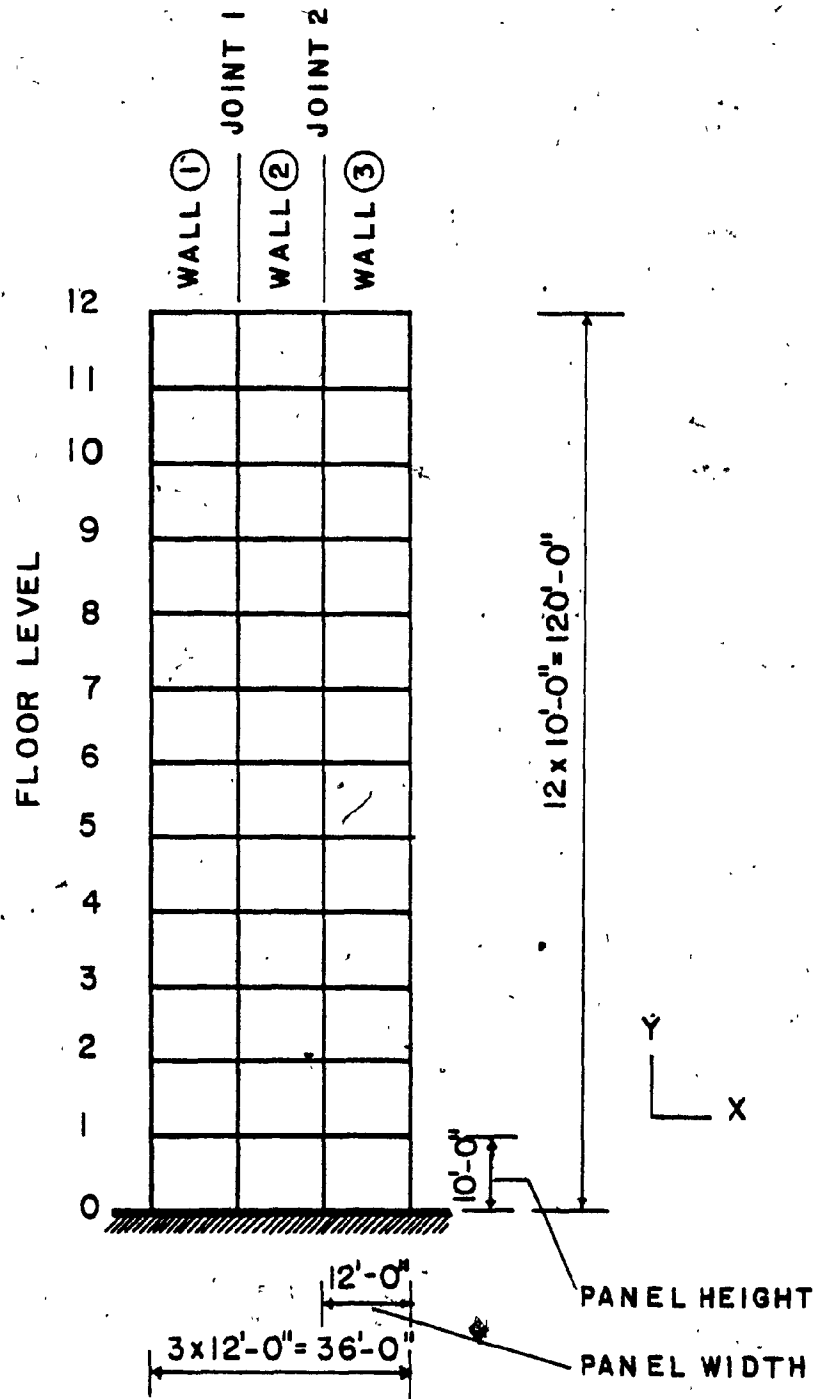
ELEVATION OF PANEL STRUCTURE
